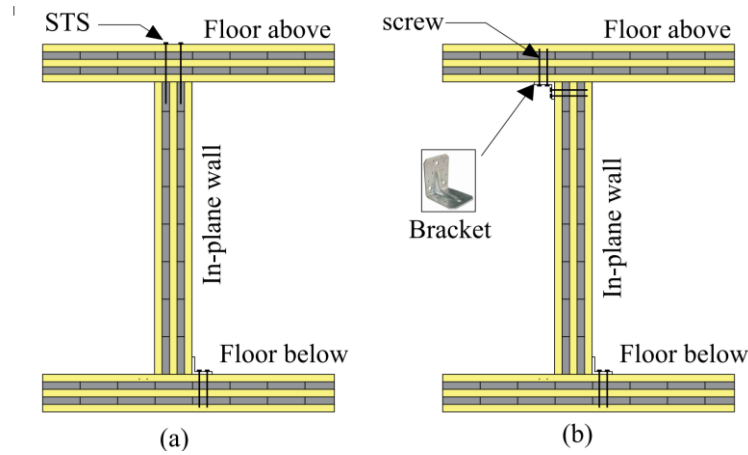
Cross section of in-plane connections floor to in-plane walls: (a) STSs connection and (b) bracket connection
